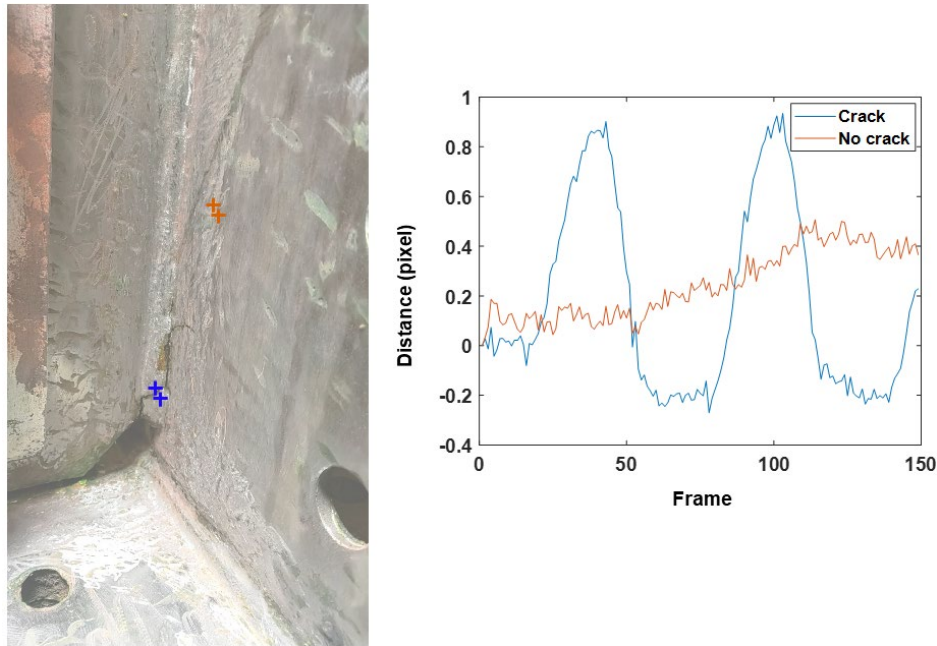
Out-of-plane fatigue crack detection result of the bridge girder specimen
